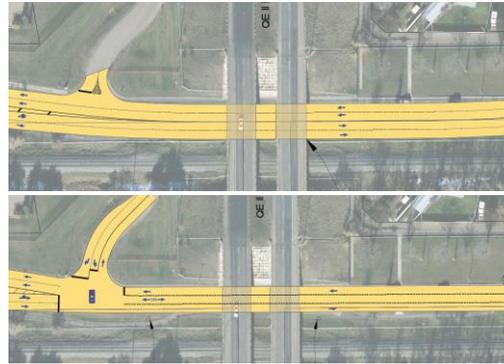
Black Gold Drive Interim Stage Alternatives (Top, 4-lane cross-section; Bottom, 3-lane cross-section with reversible center lane)
